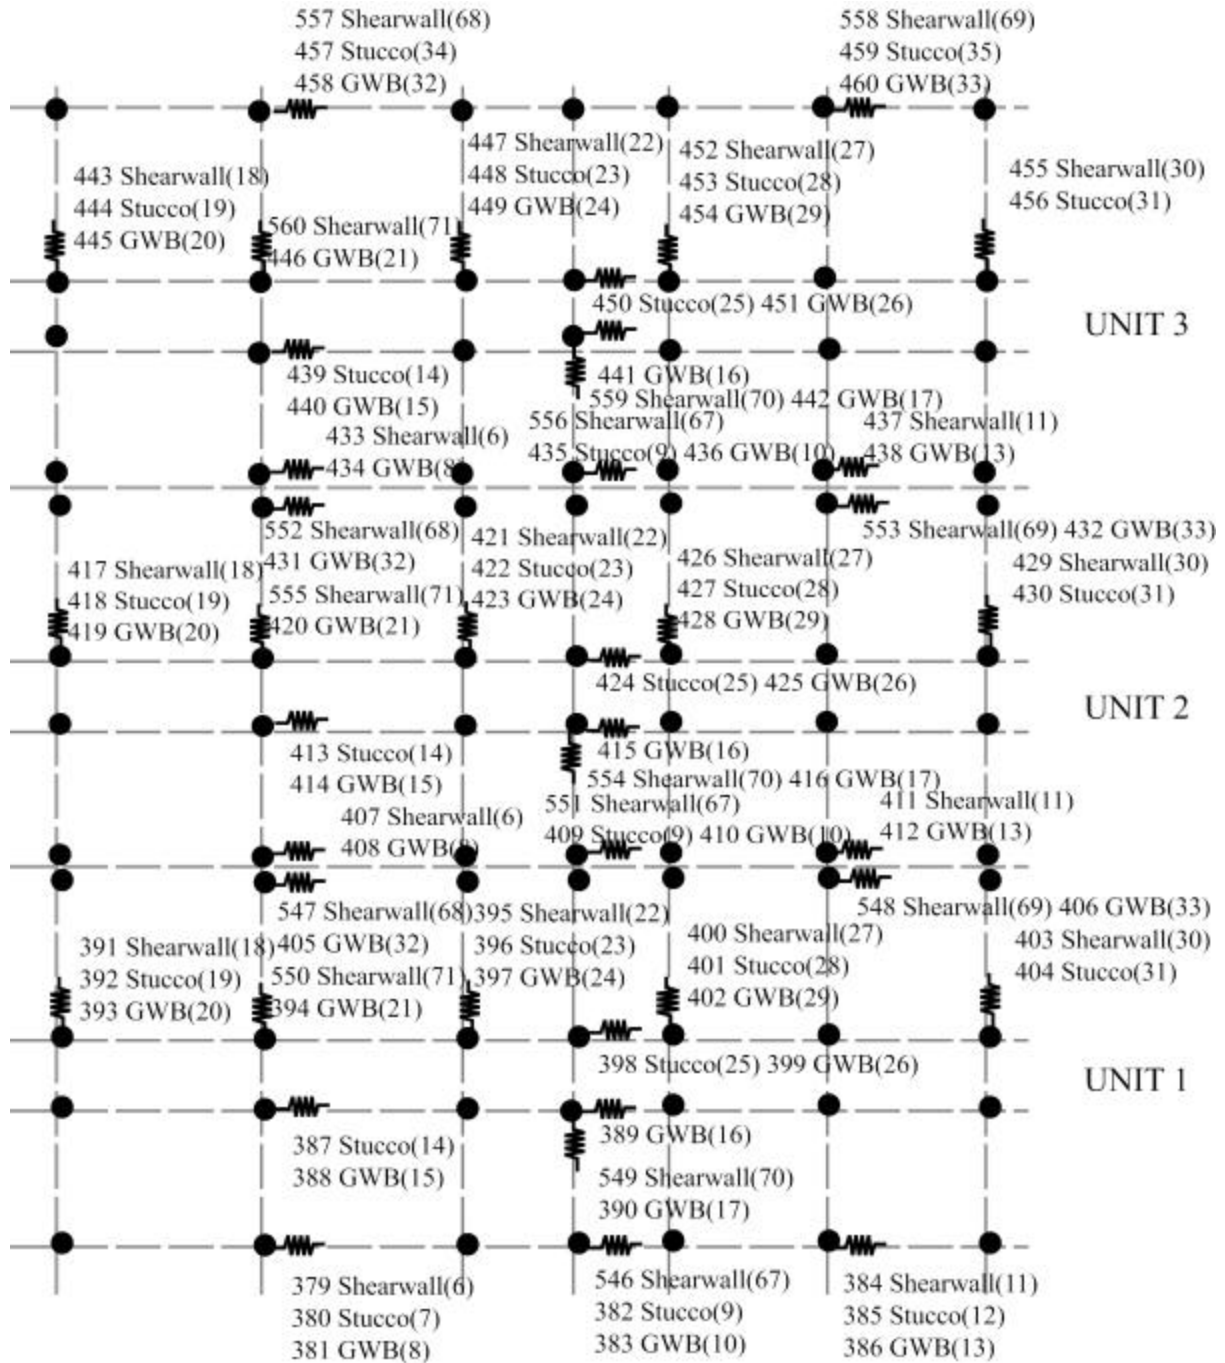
Locations, Orientation and Numbering of First Floor Shear Elements for Retrofit Measure No. 5 of the Townhouse Index Building.
